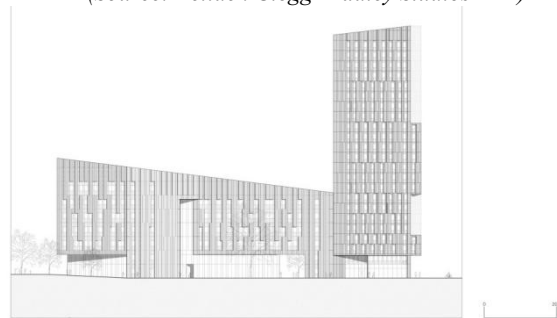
West elevation with 20% glazing ration (Source: Feilden Clegg Bradley Studios LLP)
